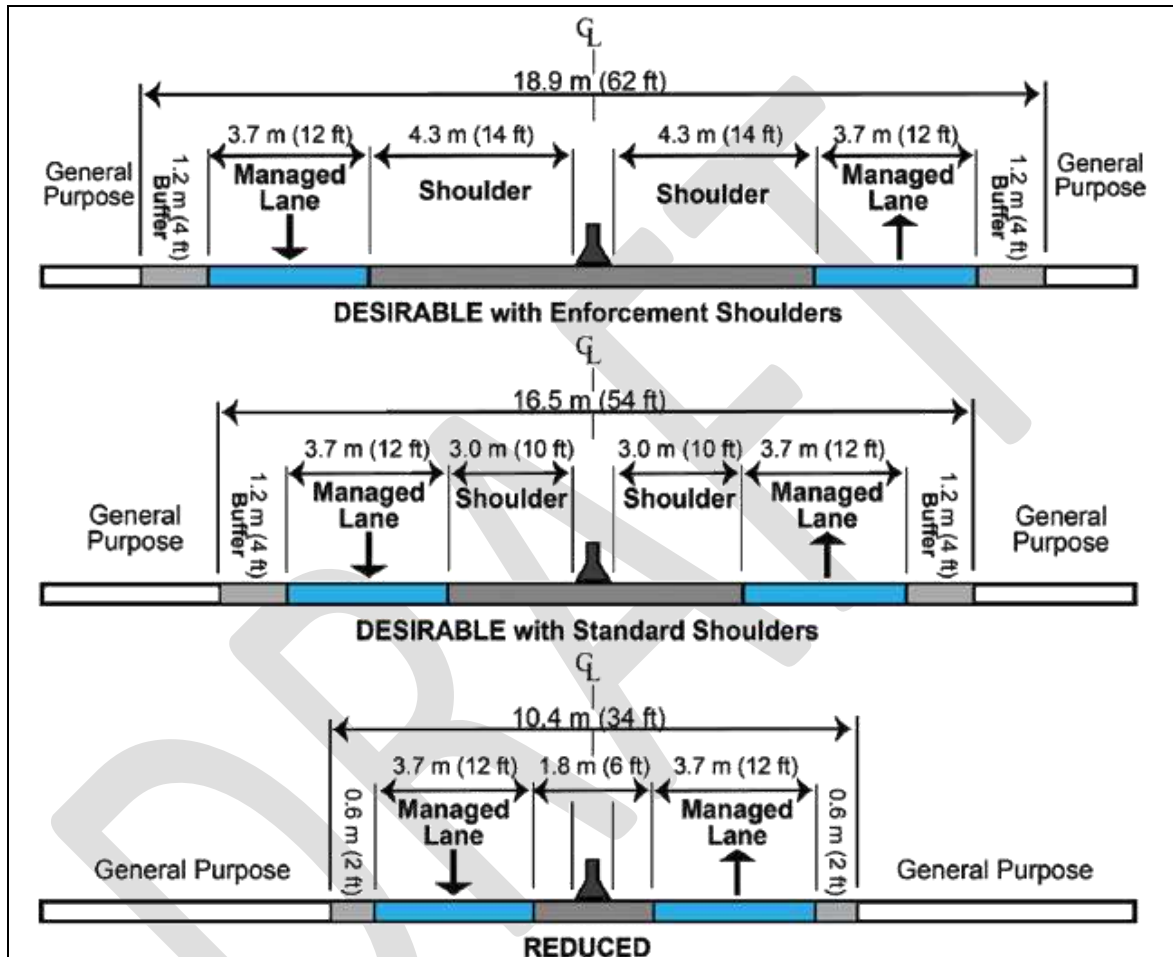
Example of Cross Sections for Barrier-Separated Two-Way HOV Facilities
